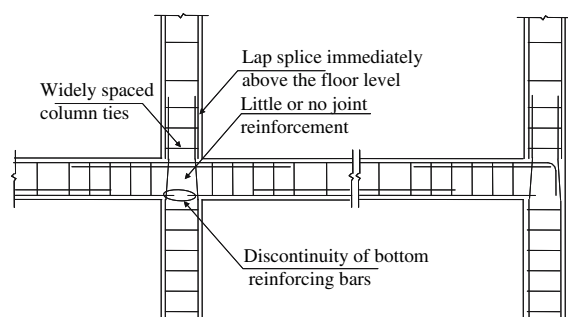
Typical non-seismic reinforcing detail of RC frame designed for gravity load only
